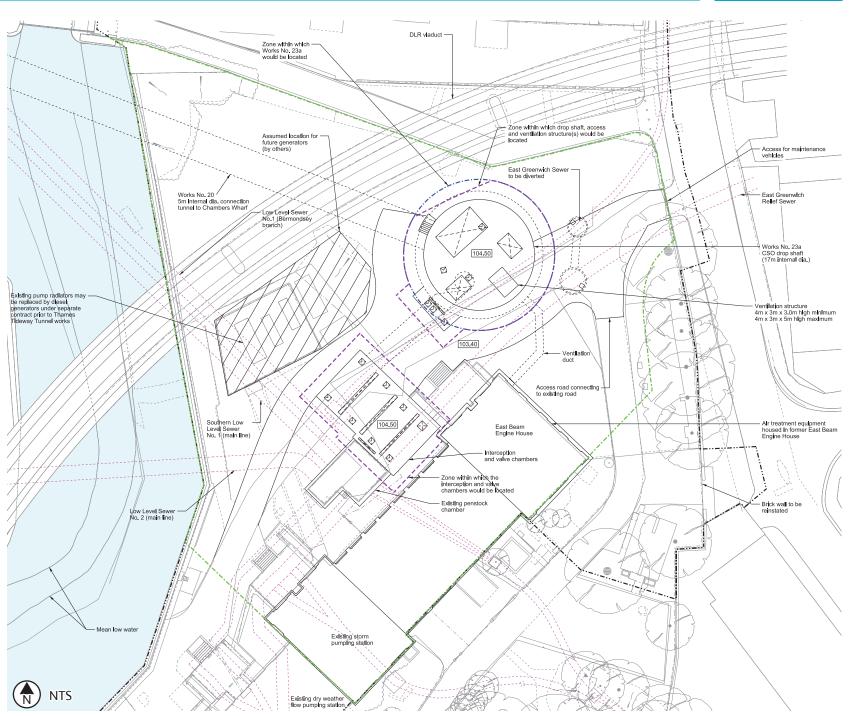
Permanent works layout - refer to Permanent works layout in the Book of Plans
